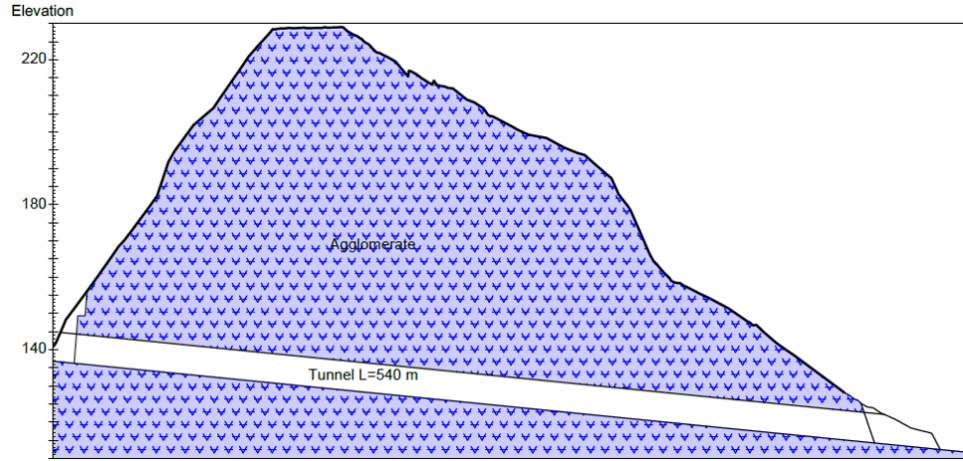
Longitudinal cross-section of Bahçecik tunnel
